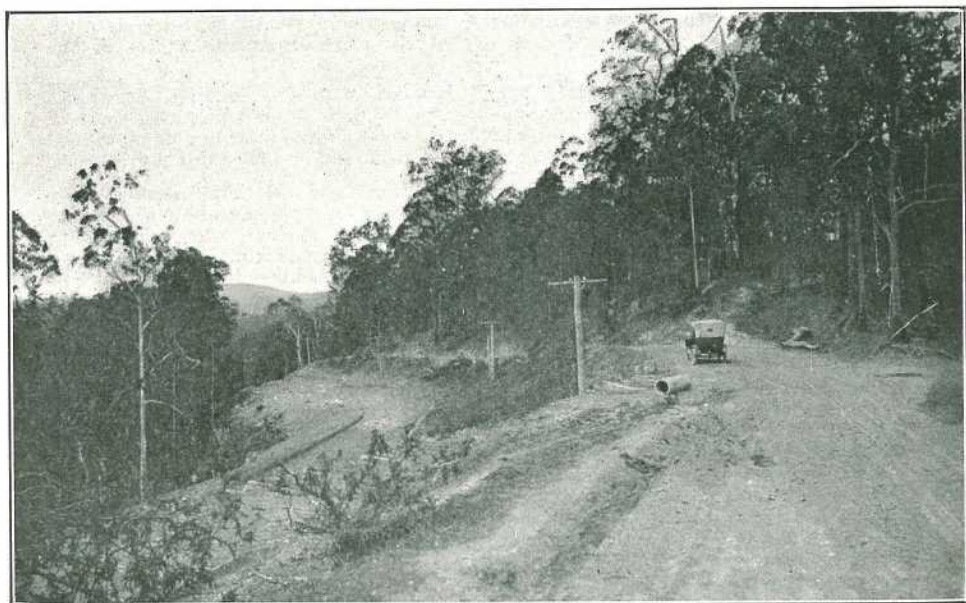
SHOWING OLD ROAD—NEW ROAD BELOW—NOW UNDER CONSTRUCTION.
